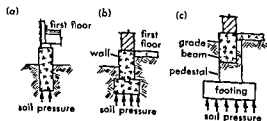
Foundation walls. (a) Simple wall. (b) Wall and continuous footing. (c) Grade beam and footing.
